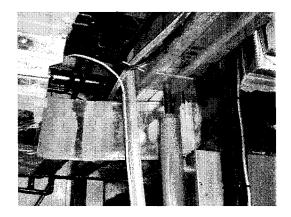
,002.jpg</u>, shows the 20"x8" return-air trunk turning to the back of the air-handler and connecting to the 16"x18" drop. The vibration isolation collar and sealant of trunk joints can be seen.
